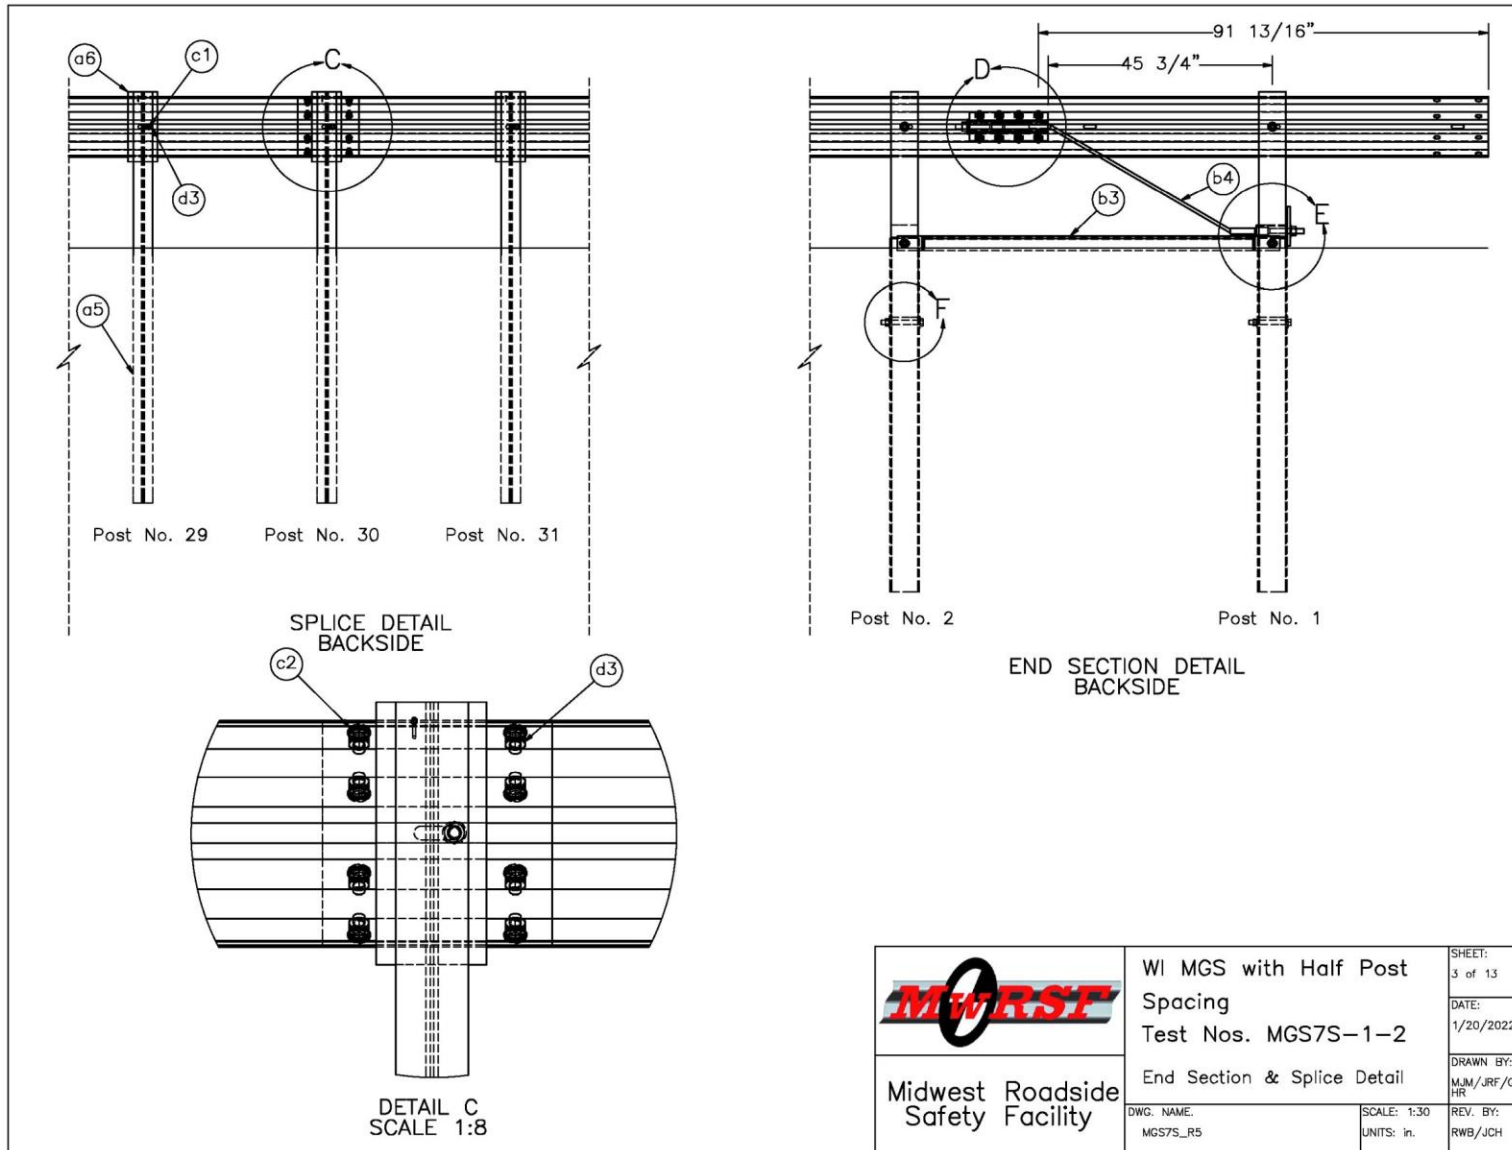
End Section and Splice Detail, Test Nos. MGS7S-1 and MGS7S-2
